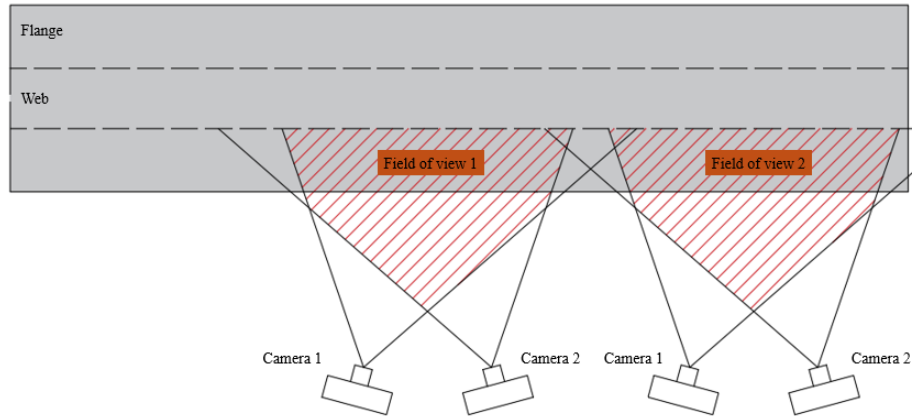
Sketch of cameras field of view on a 6 m girder
